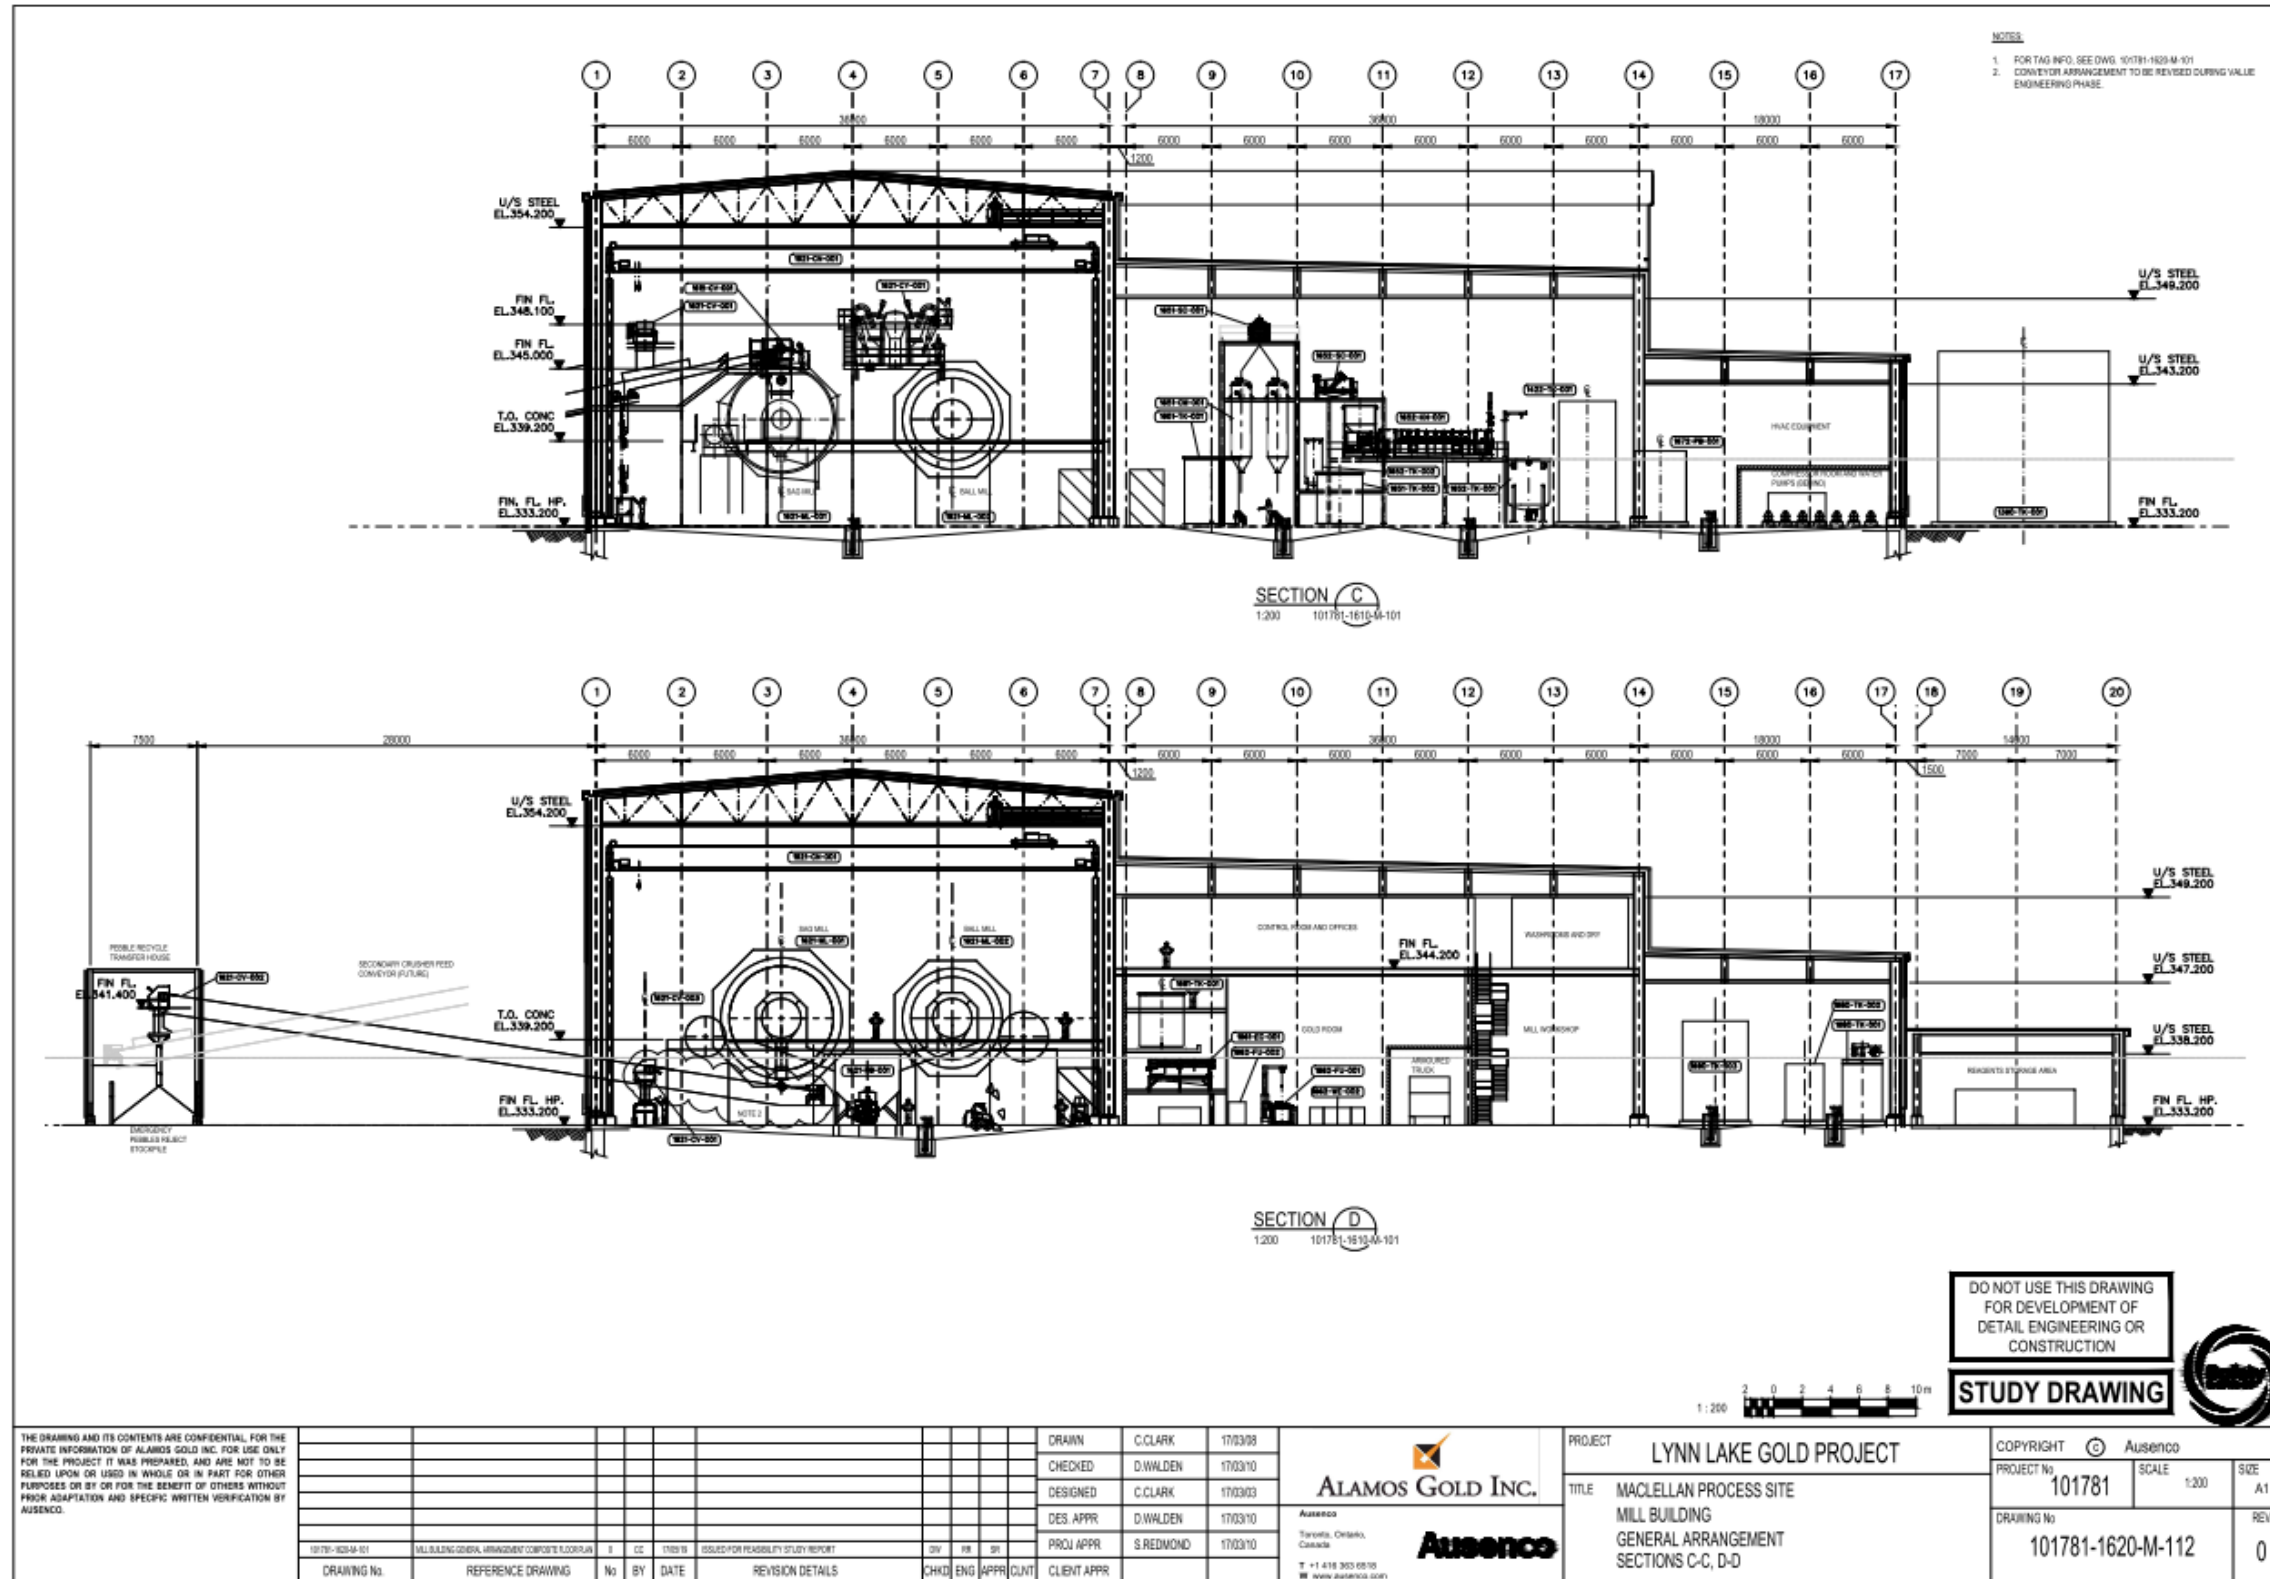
MacLellan Mill Building General Arrangement, C-C and D-D
